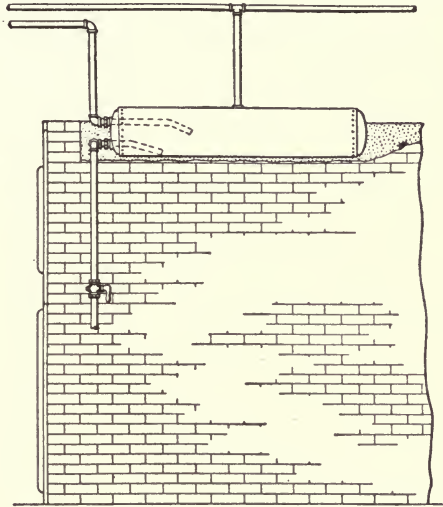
Method of Heating Boiler by Placing it in Sand Over Oven.
